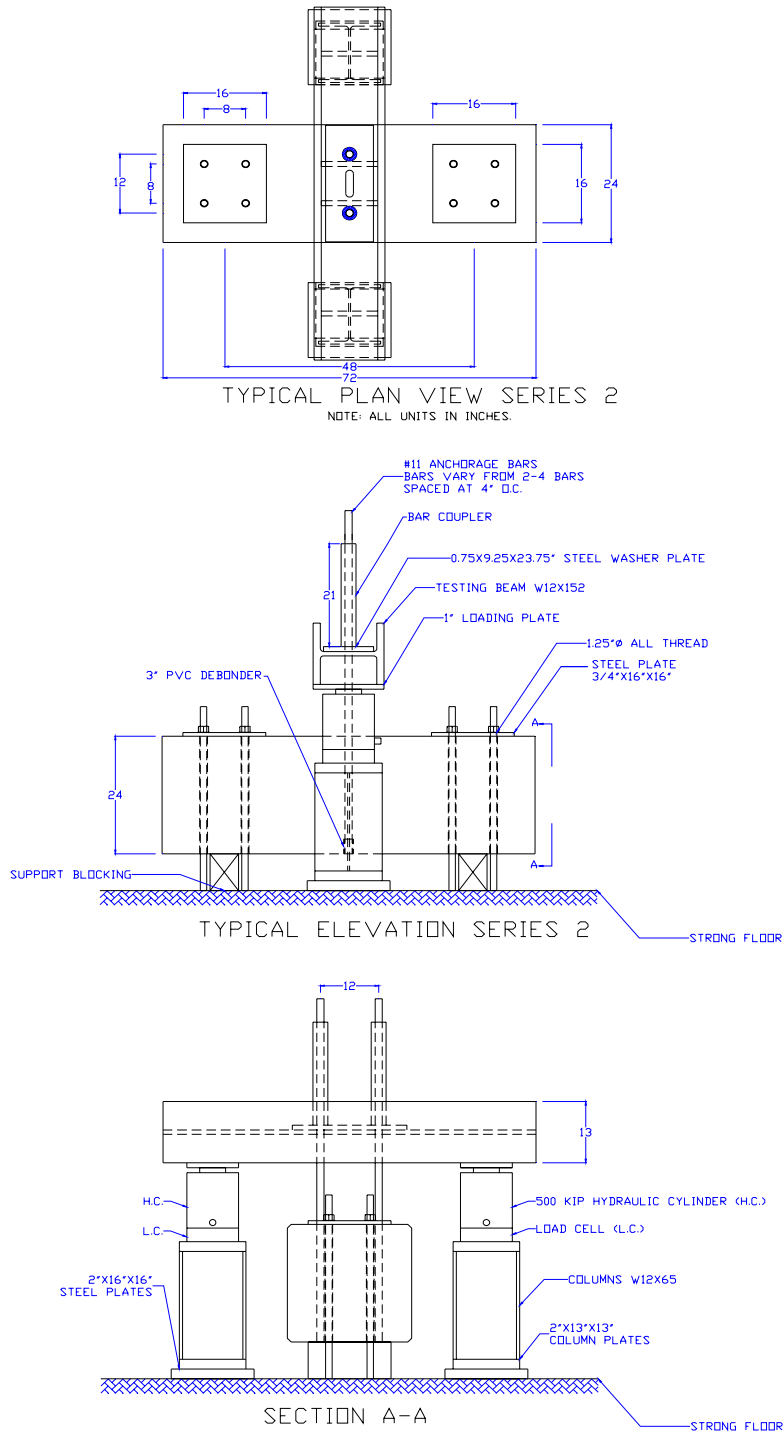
Typical testing setup for series 2 specimens (4 bar configurations not shown)
